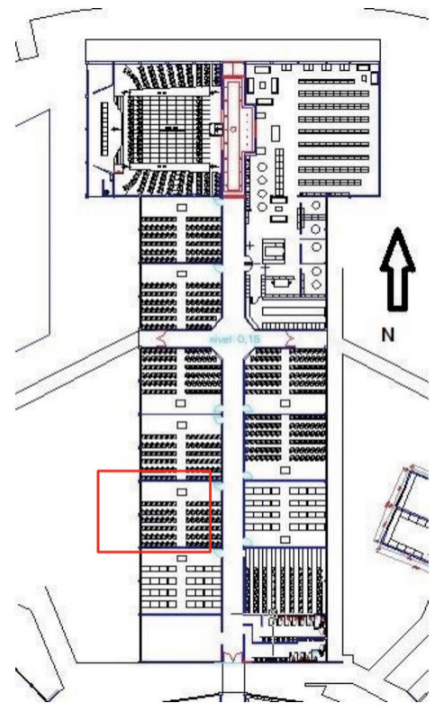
Floor plan of Classroom Three on the F.I.O. Campus, highlighted in red in Room 305, Ourinhos-S.P.
